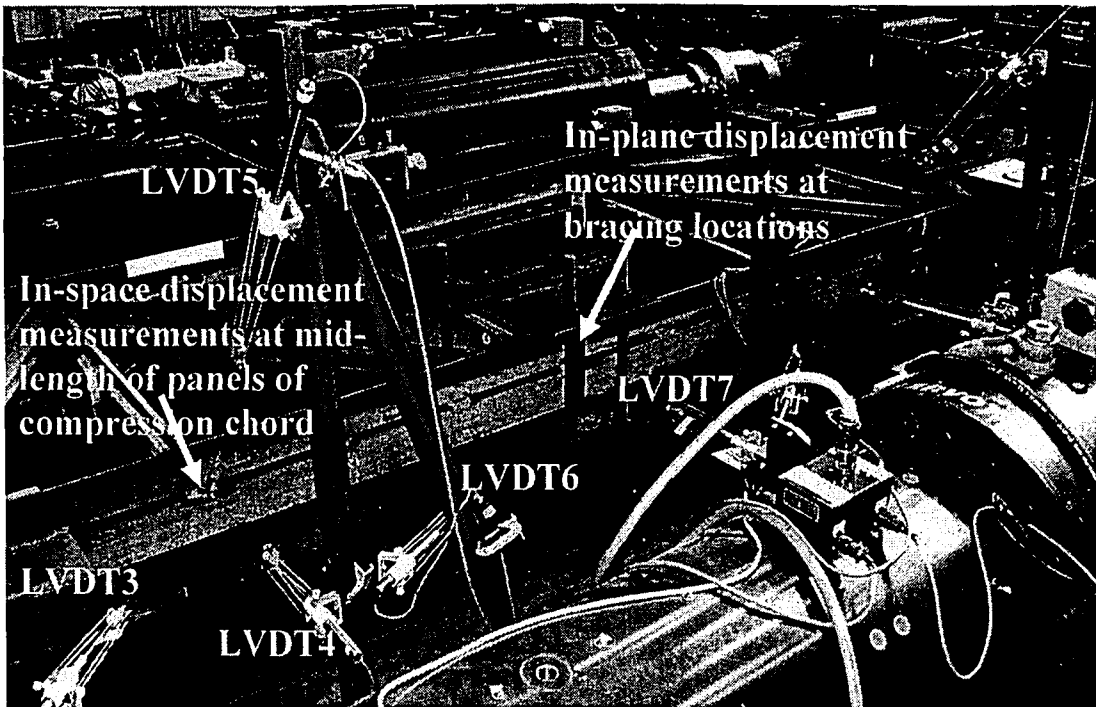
Instruments at Mid-panel Points and at Bracing Locations in CM Test Specimens
